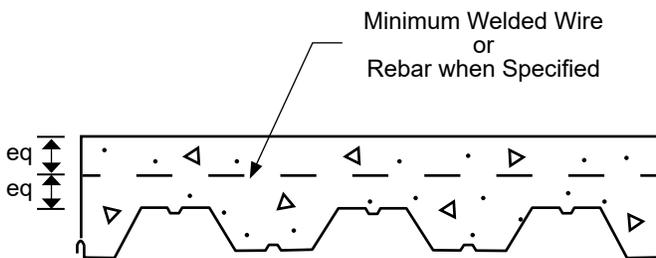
TYPICAL PLACEMENT OF TEMPERATURE & SHRINKAGE REINFORCEMENT
